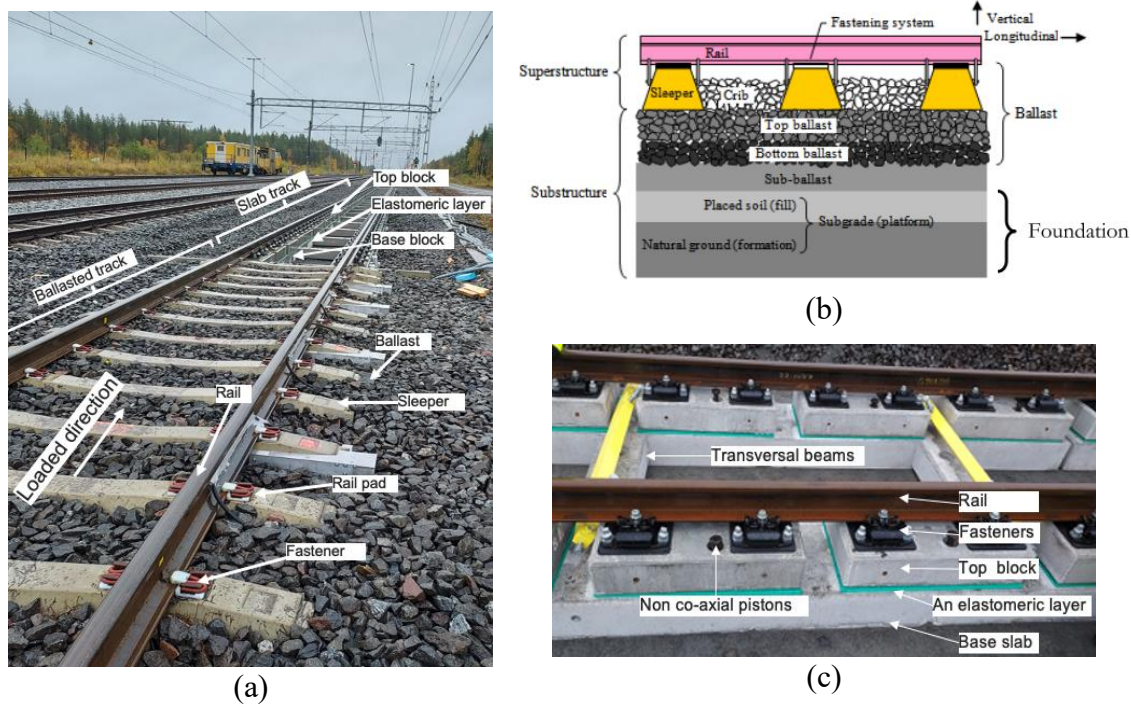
(a) View of transition zone between ballasted track and 3MB slab track; (b) Cross-section of ballasted track including rail, rail pads, fasteners, sleepers (crossties), ballast, sub-ballast, and subgrade [30]; (c) 3MB slab track design consisting of base slabs, top blocks, and an elastomeric layer between the concrete layers.
